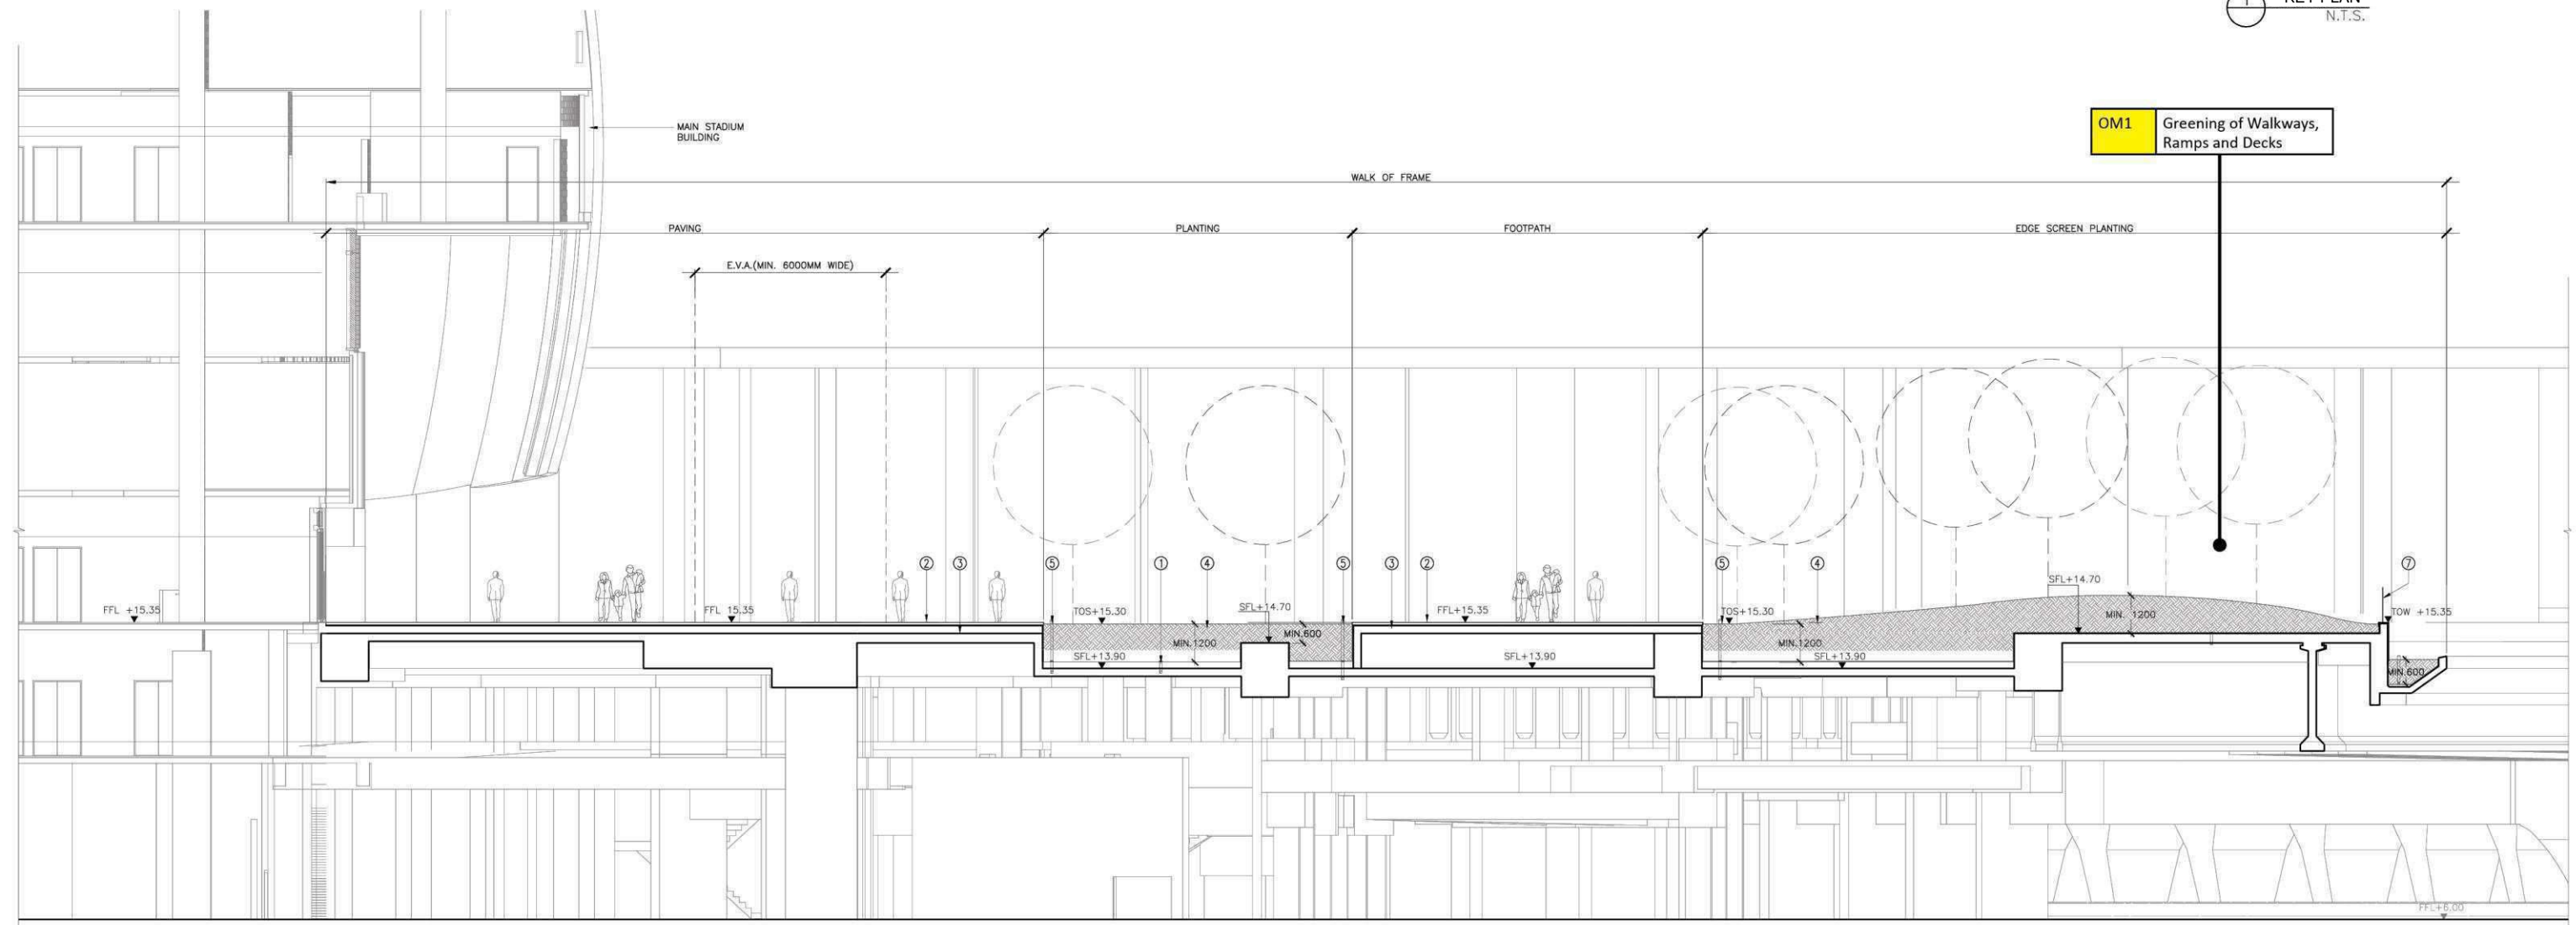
Blow -up Plan of Walk of Fame and Event Village
